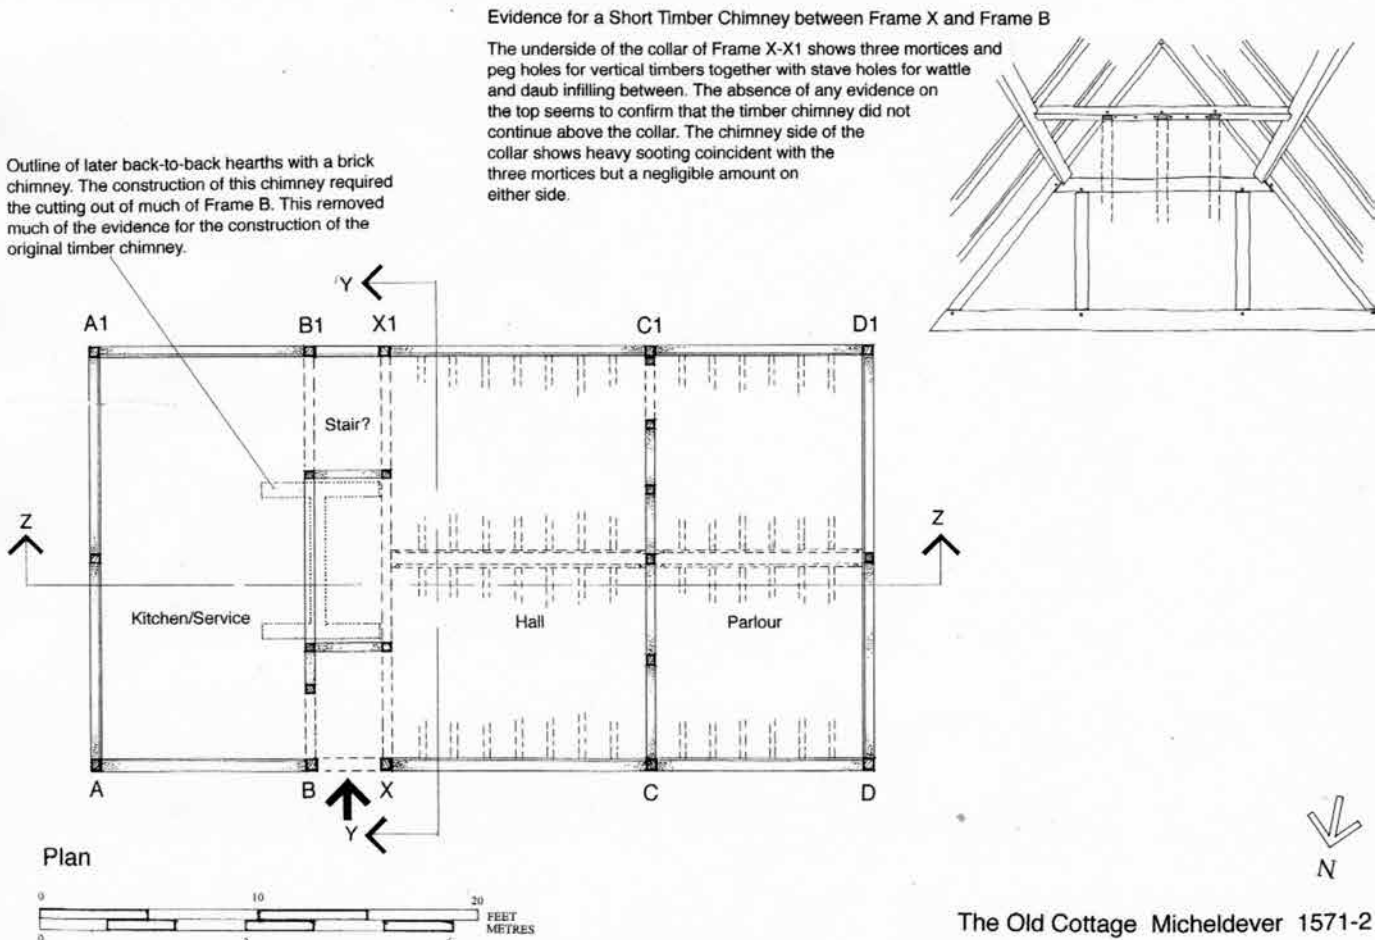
Plans and Sections of The Old Cottage with a detail indicating the surviving evidence for the timber flue at Frame X.
